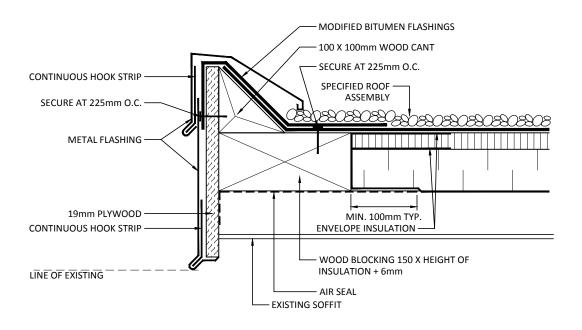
DETAIL NAME: PARAPET DETAIL			PROJECT NO.: BD18053
